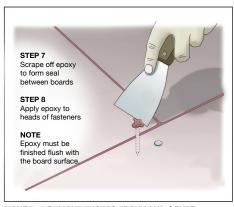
REMOVE EXCESS EPOXY AND COVER FASTENER HEADS
